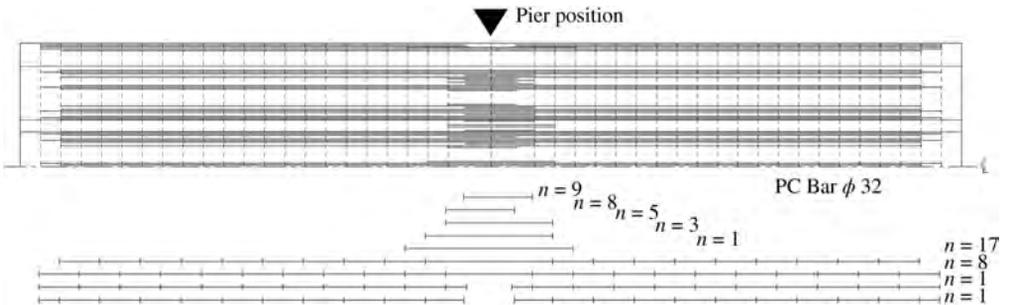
Cantilevering tendon layout of cable-stayed bridge (plan view of half top slab)
